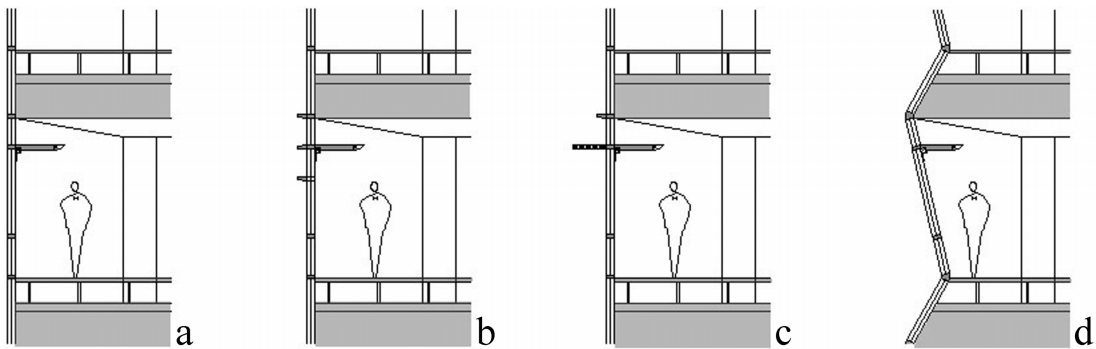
Four alternative curtainwall designs proposed for the southeast façade: (a) base building with interior light shelf, (b) three small exterior horizontal shades added to base building, (c) 2 ft exterior shade added to base building, and (d) sloped glass with base building light shelf.
